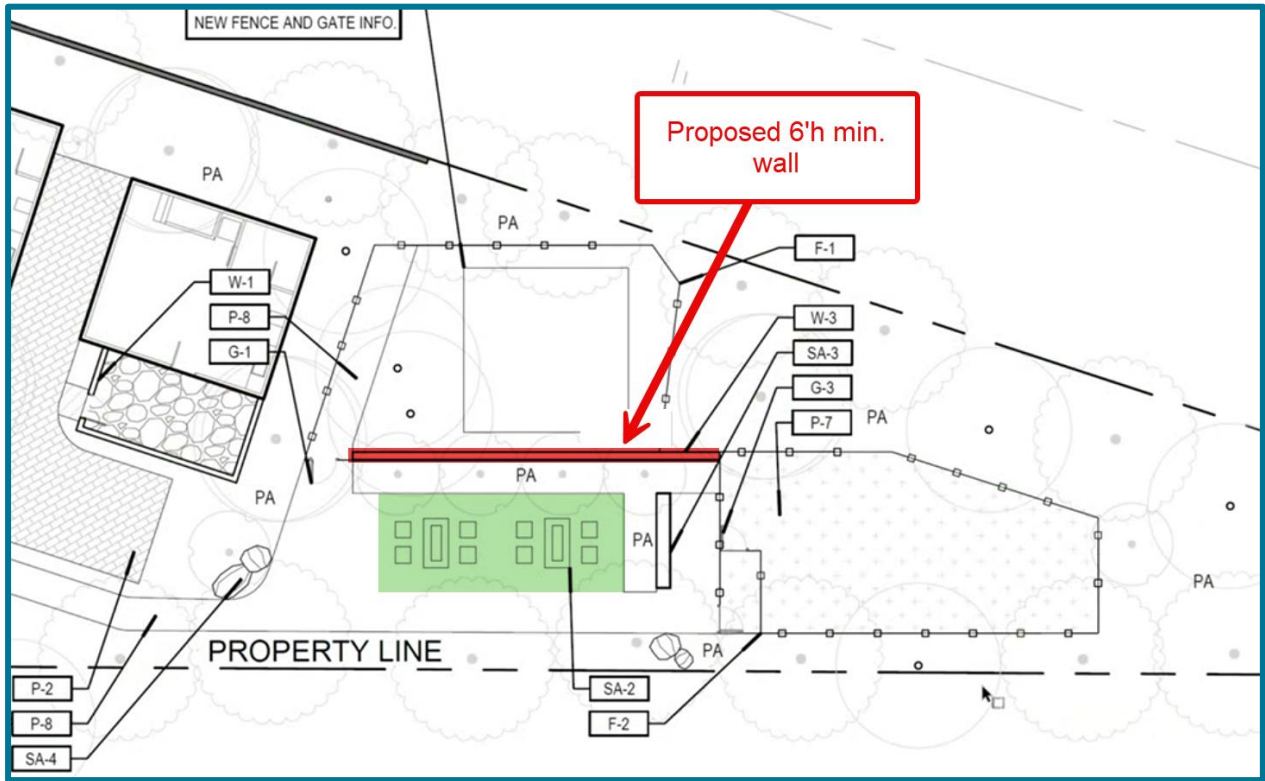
Landscape sketch of eastern outdoor area (green) with proposed noise barrier wall (red)
